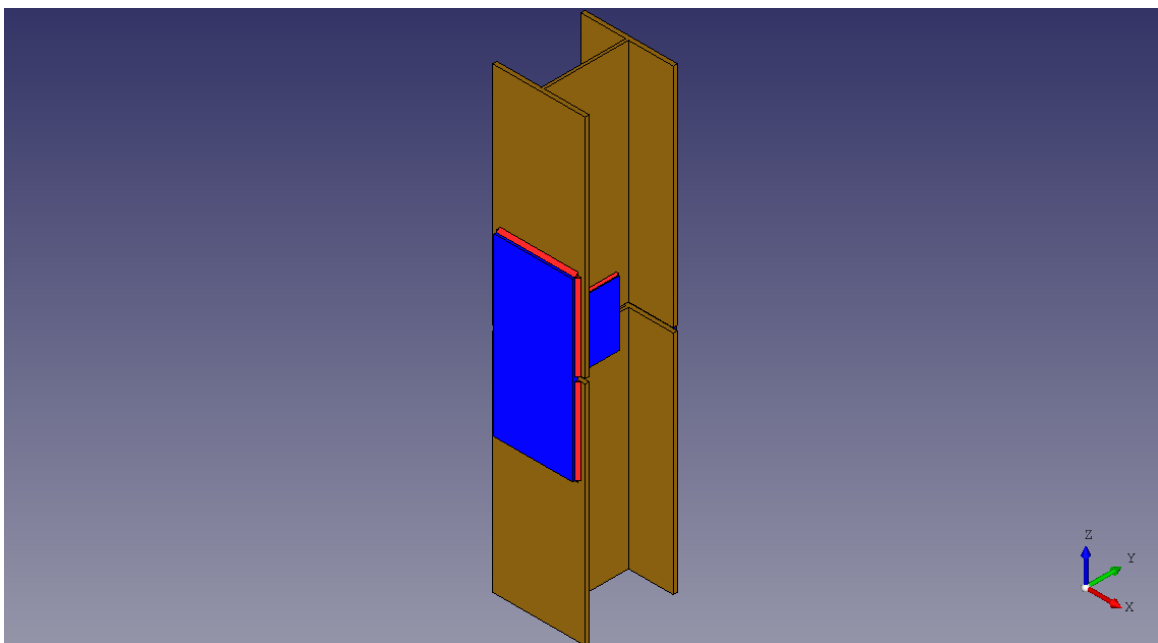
3D drawing output of typical Column-Column Cover Plate Welded connection
